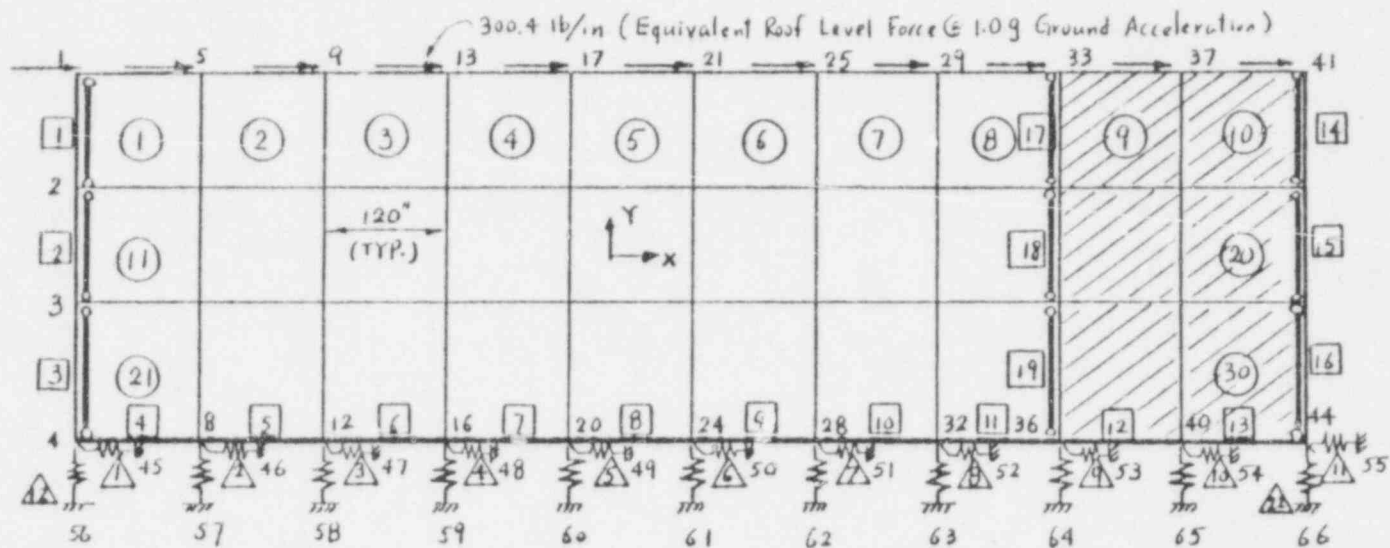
FINITE ELEMENT MODEL OF NORTH WALL
